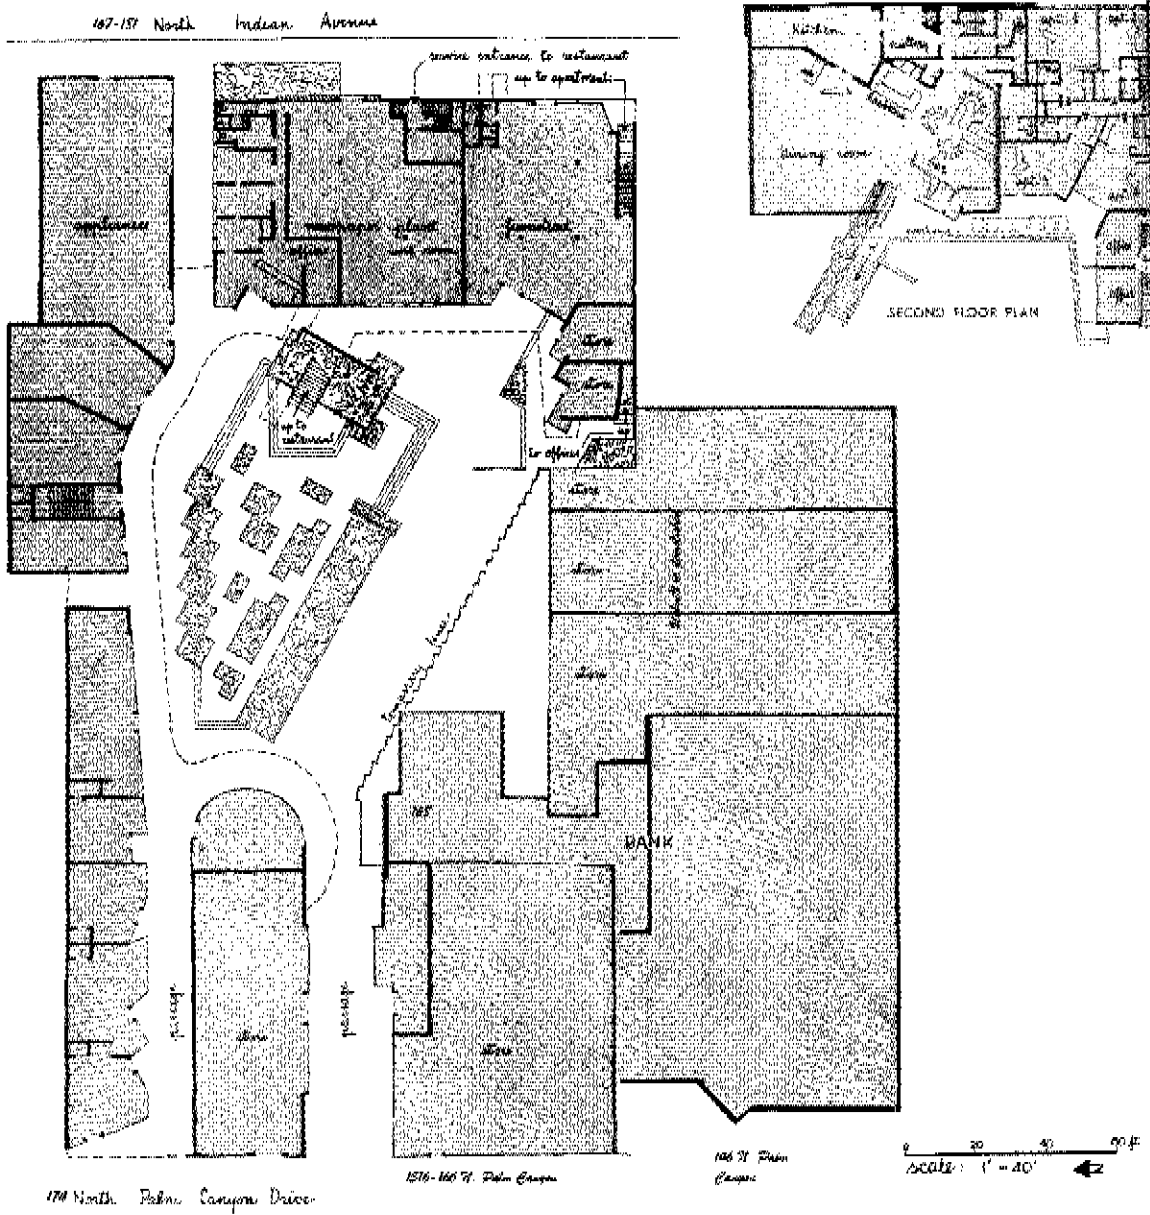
Site Plan Source: Shopping Centers, Design & Operation 1951.
